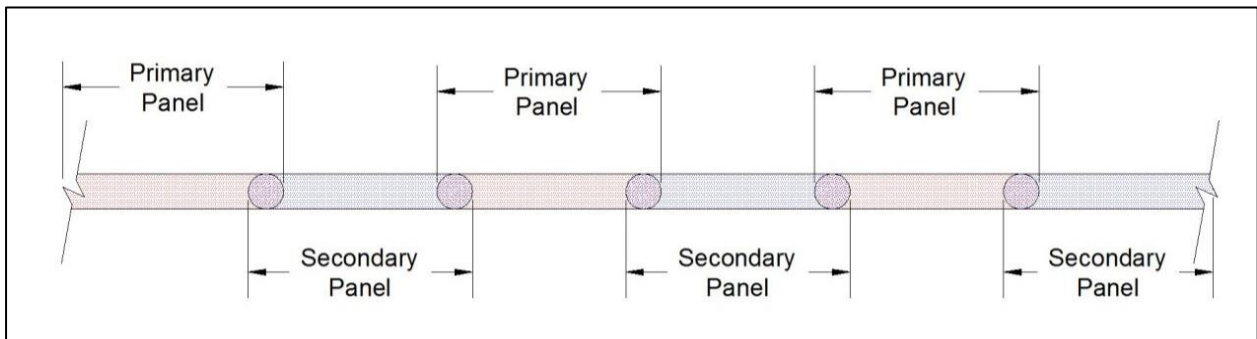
Schematic of panel sequencing for construction of concrete cutoff wall.
